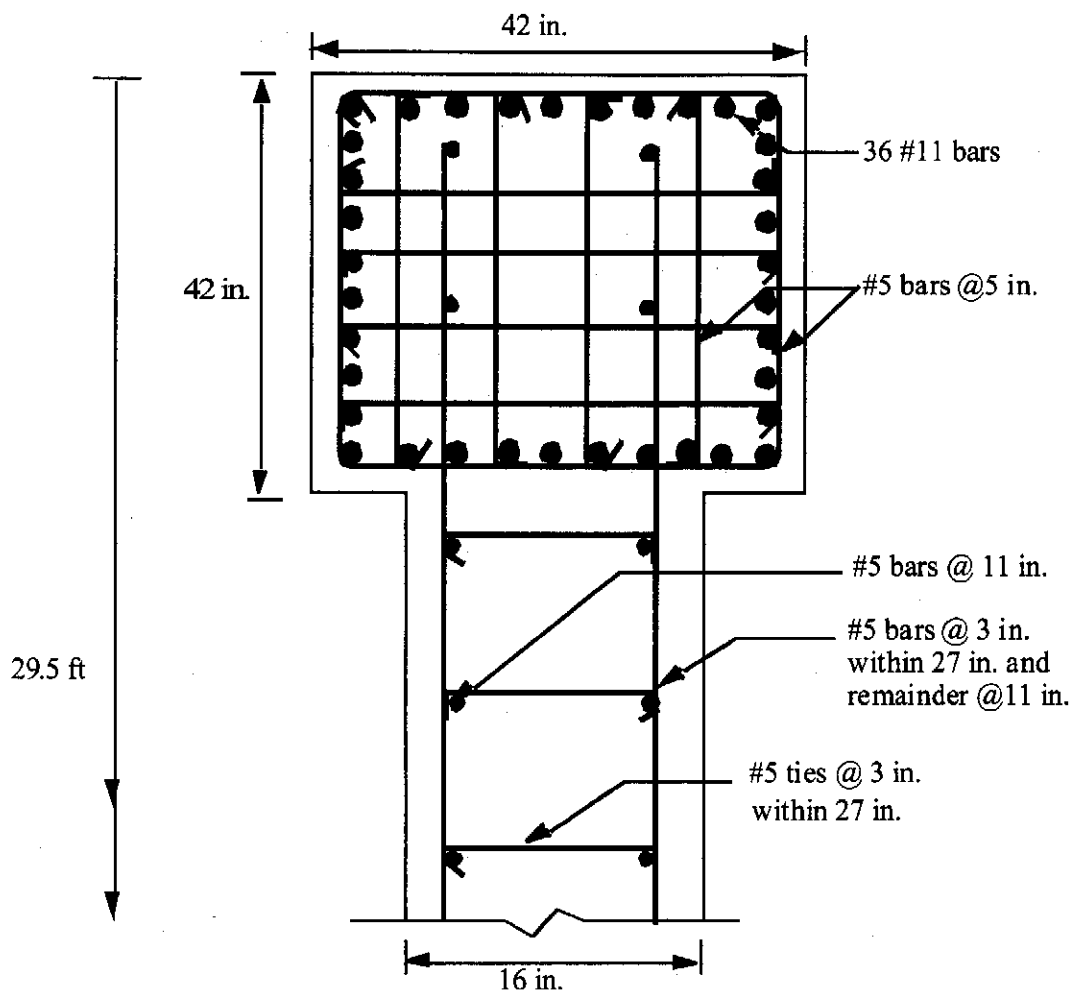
Reinforcement details for shear wall C2-D2 (between grade and level 2) by static force procedure
